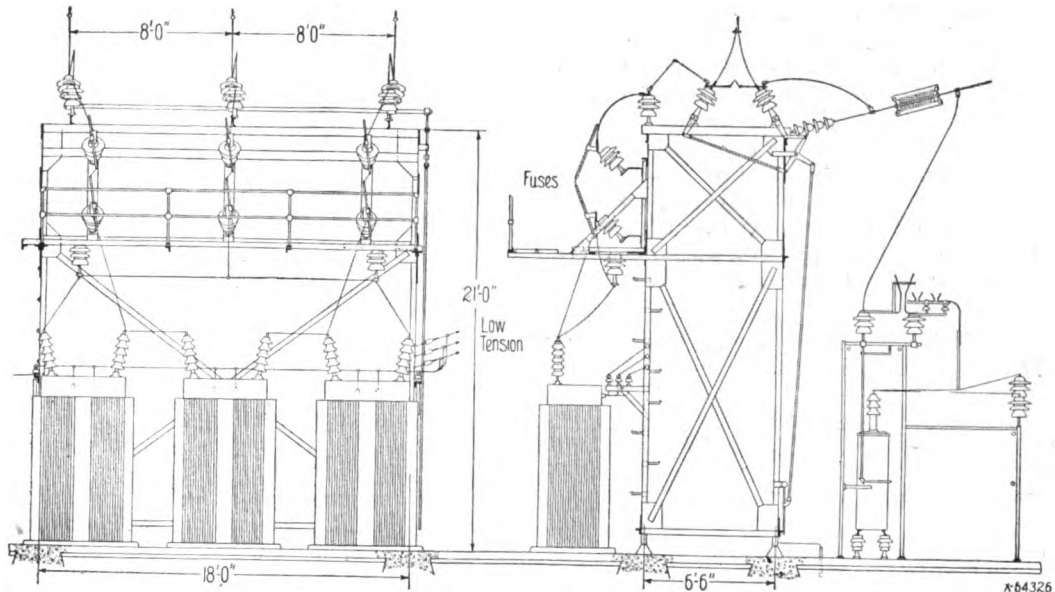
TYPICAL 50,000-VOLT OUTDOOR SUBSTATION
